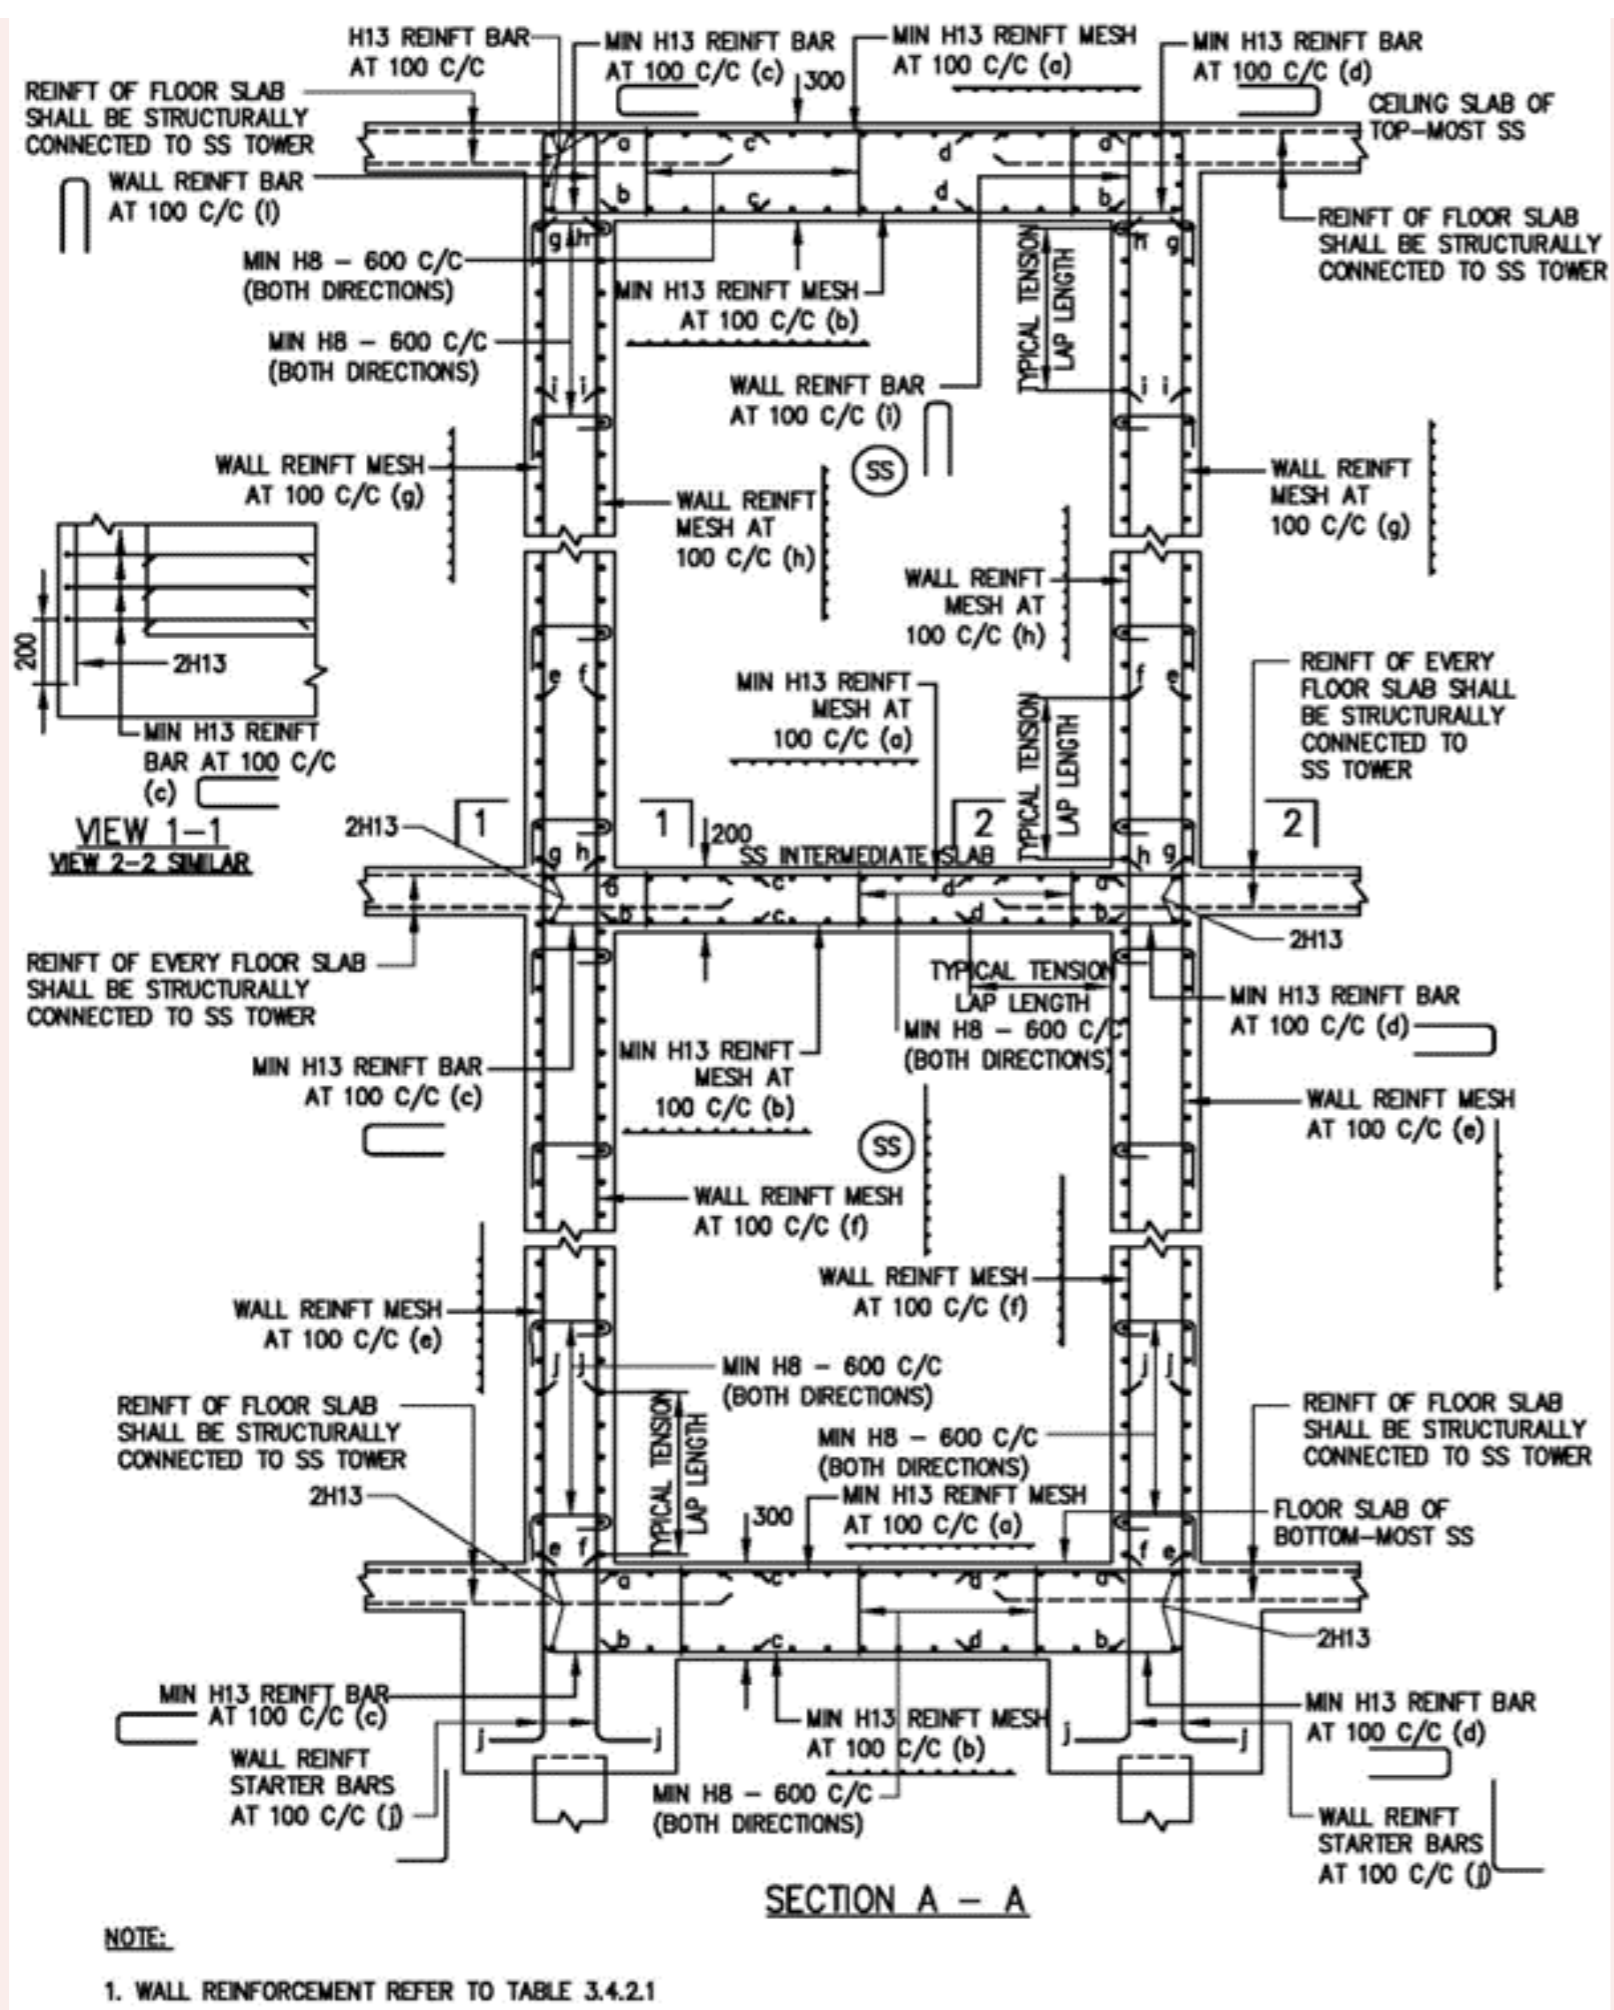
(c): SECTIONAL DETAILS OF SS SLABS/ WALLS
